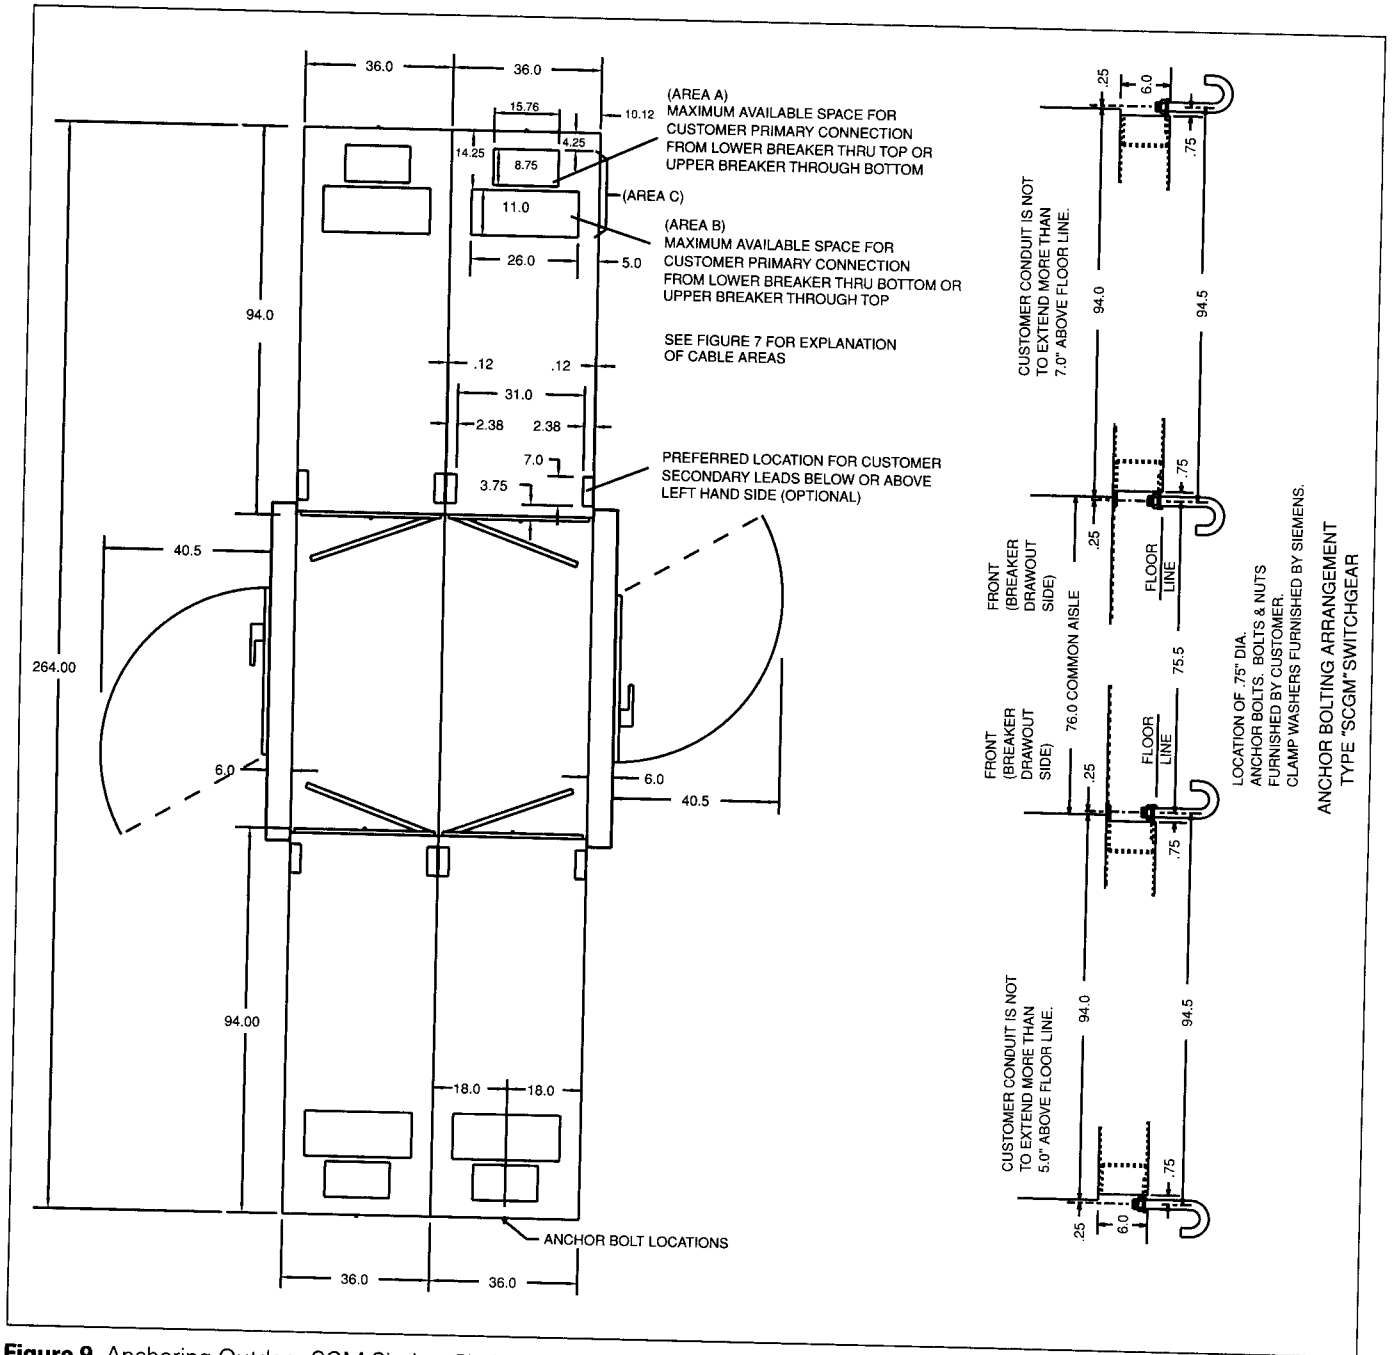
Anchoring Outdoor SGM Shelter-Clad (common aisle) Switchgear
